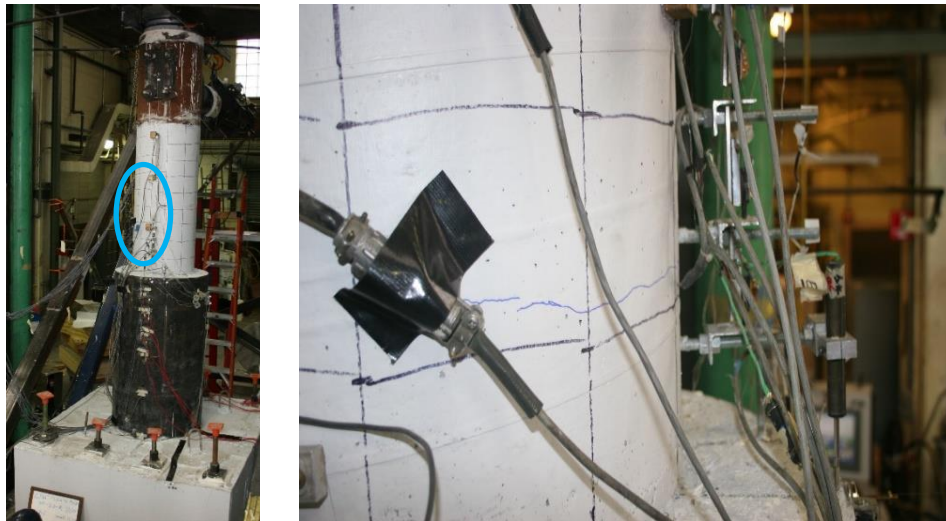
Specimen 30-21-R Horizontal Crack on Northern Column Face at 0.5% Drift
